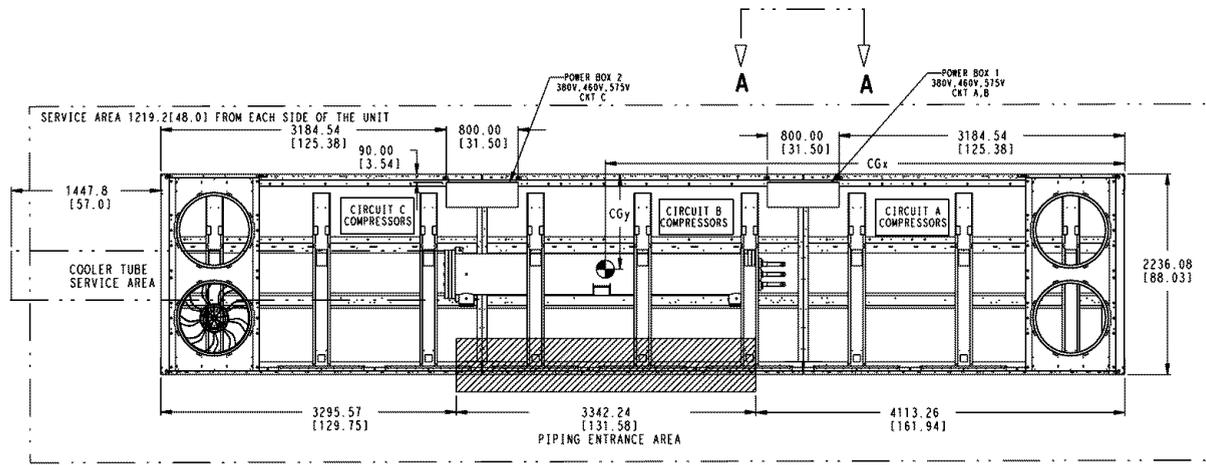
30RB250 Air-Cooled Chiller Dimensions
